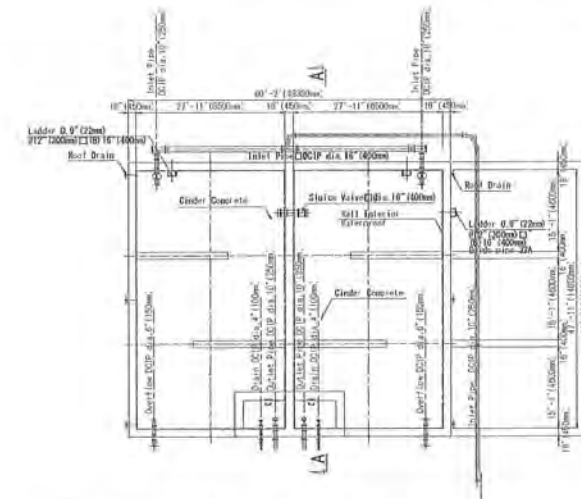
Proposed Plan of Malakal Service Tank
